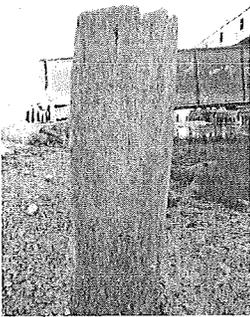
Pile B3, typical pile in satisfactory condition, looking north.
